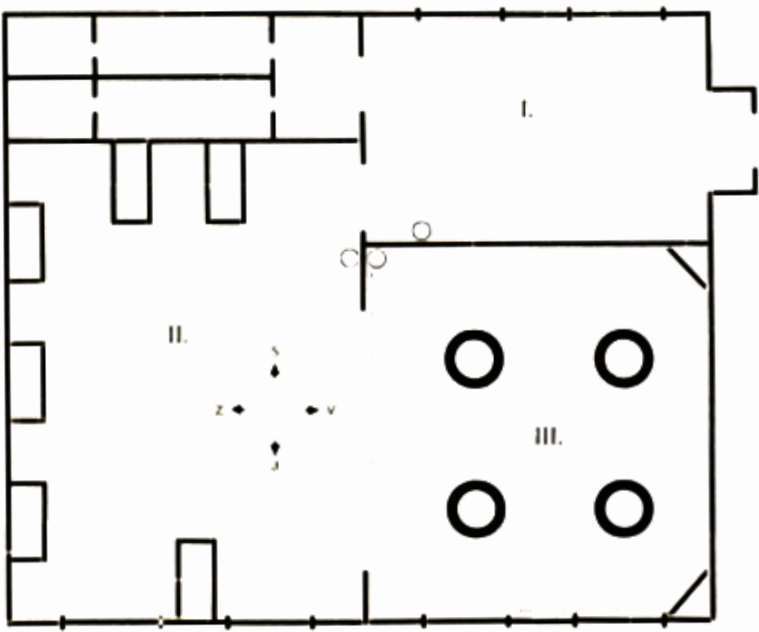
| Reform preschool floorplan (Süssová, 1912), I. – changing room, II. – playroom, III. – workroom
